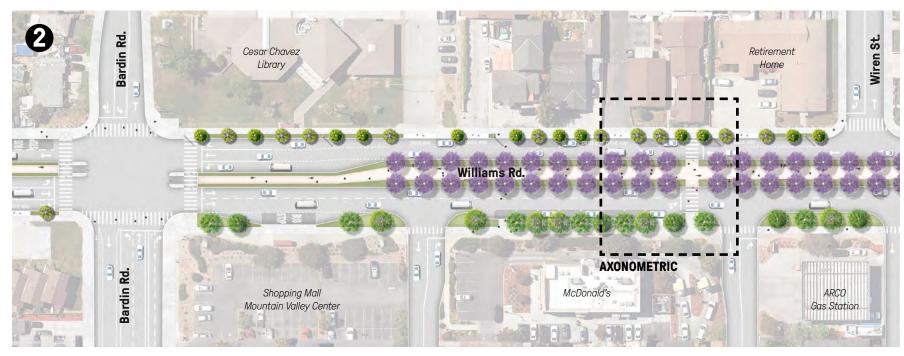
WILLIAMS ROAD AND BARDIN ROAD - FOCUS AREA VISION
